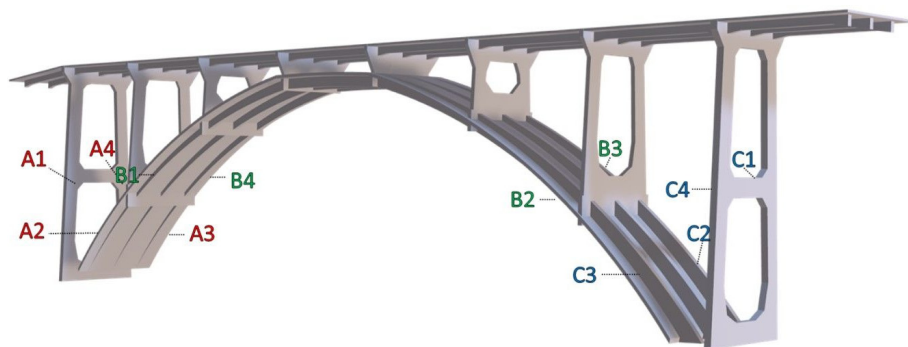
The layout of the vibrating wire extensometers system installed on the bridge.
